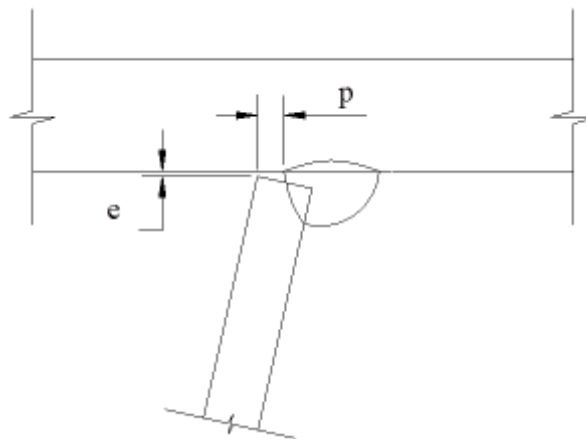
The details of rib to deck weld joint in J. Janss' fatigue tests
